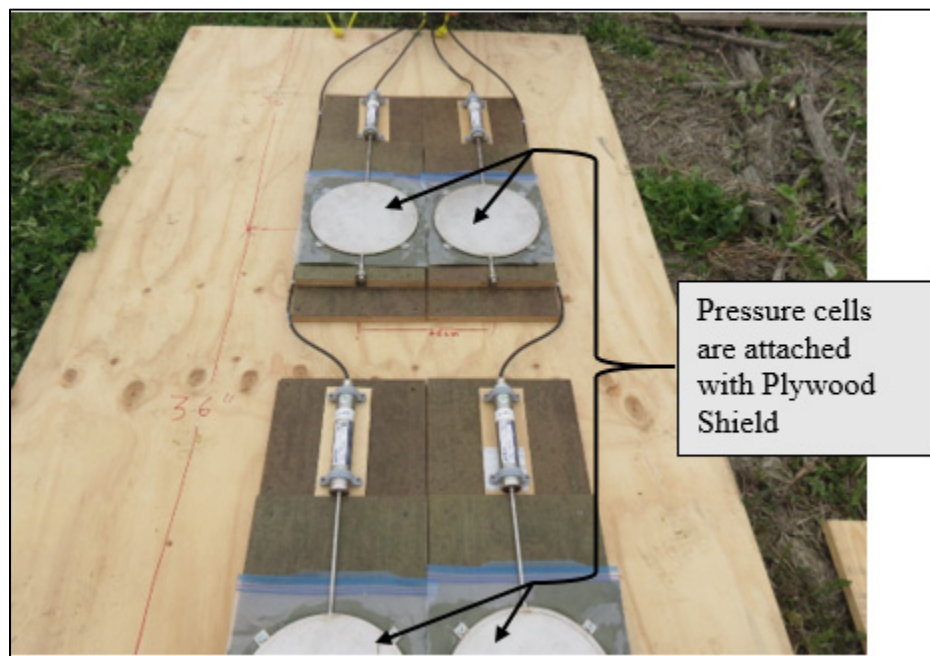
Pressures cells installation on the Plywood shield at the site before installations in the trench
